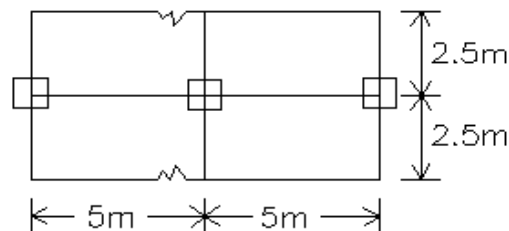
Plan Showing the Columns & Beams at Floor Levels of Plane Frame
